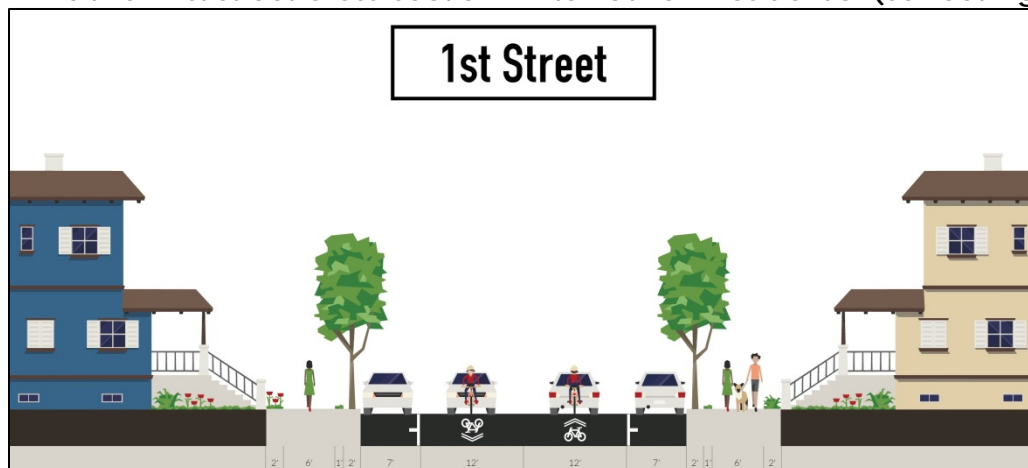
First Street Cross-section - Alternative 2 Residential (60 Feet Right-of-Way)
